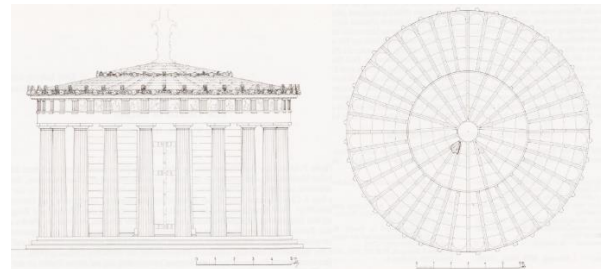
A proposal of roof reconstruction according to Hoepfner (2000).
